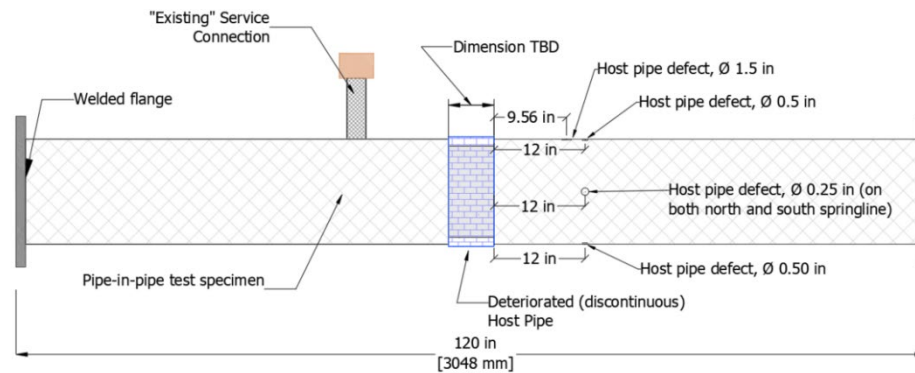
Dimensioned drawings of specimens including locations of defects and service connection
